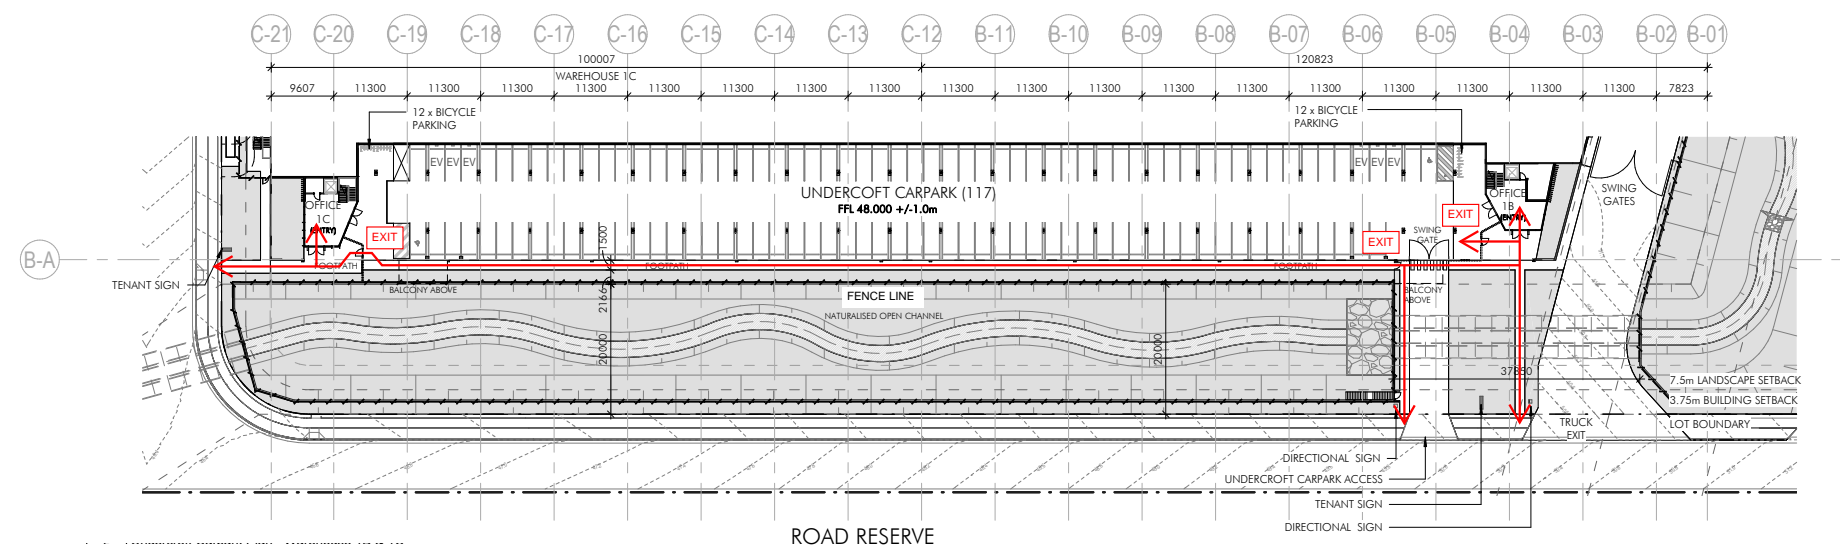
Warehouse 1B/1C – Undercroft Car Park Plan
